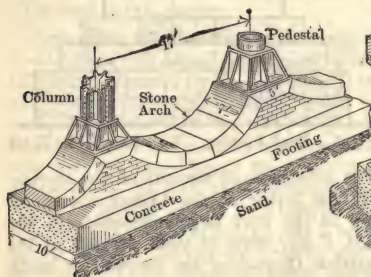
Inverted-arch Footing. Drexel Building, Philadelphia
